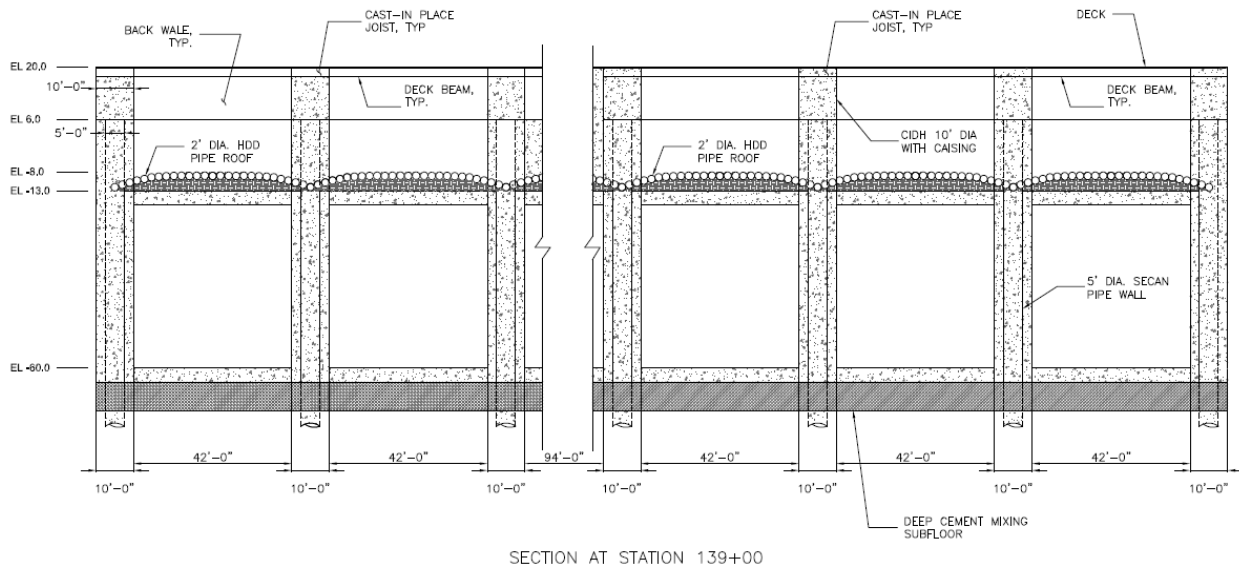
Alt. C – Alternate Cross-Sectional View of the Outlet Submerged Box Culverts, with a Temporary Horizontally Directionally Drilled Pipe Roof, and with a Cast-In-Place Concrete Liner (educator jets are not shown)
